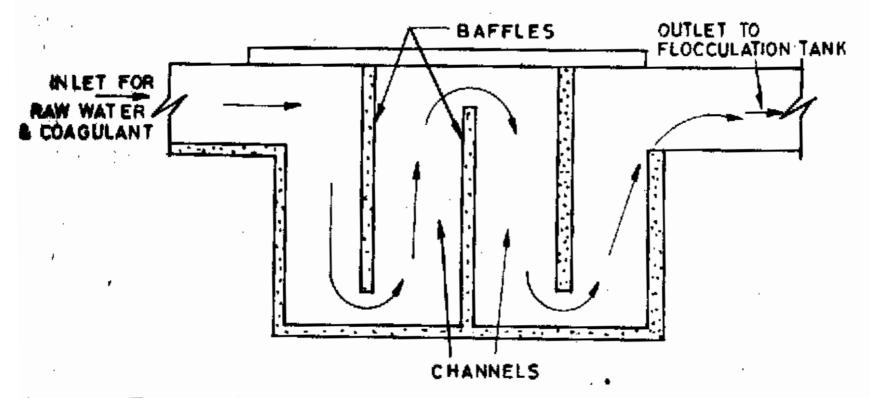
Sectional elevation of "Over and under the baffle" type mixing basin.
